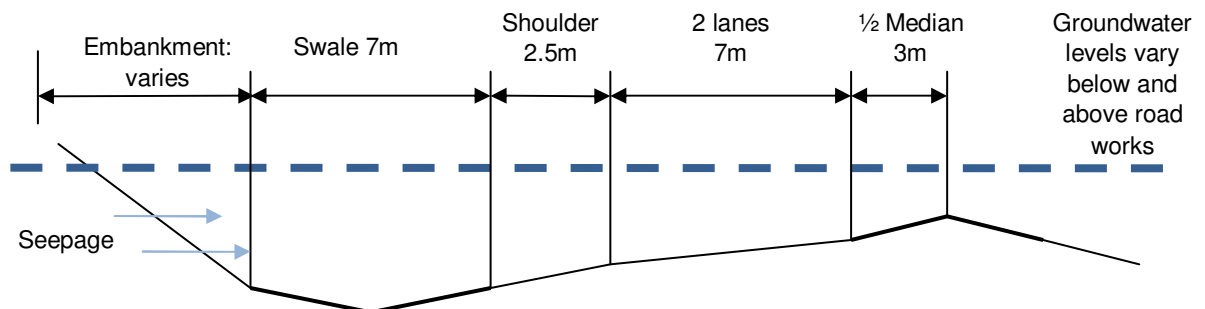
Typical Infiltration Swale Section: Station 0m to 7200m
